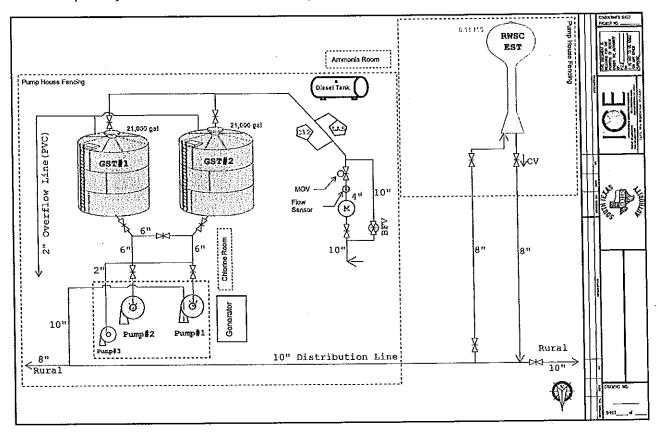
Ricardo PS#1 - Existing Pump Station Layout.
